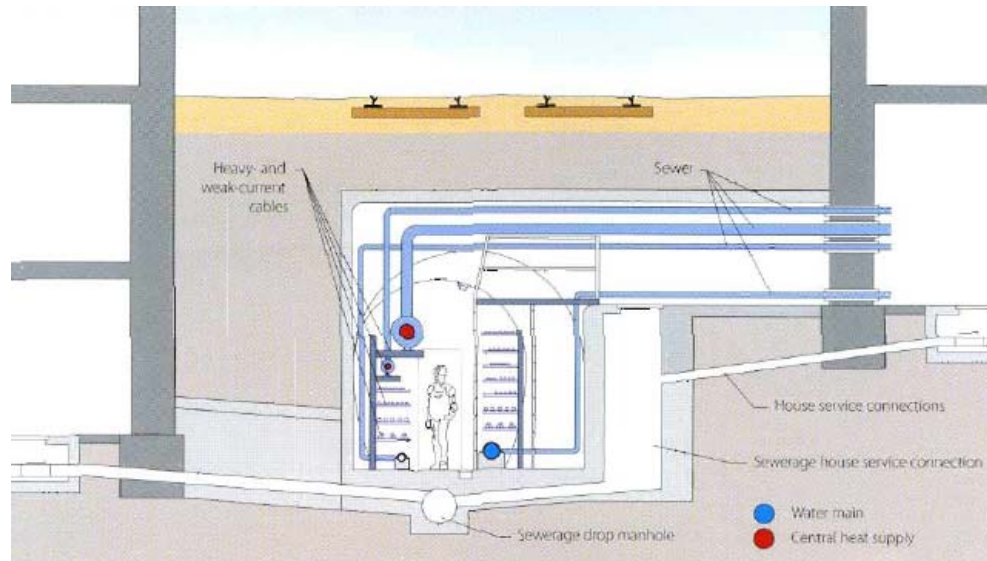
Cross Section of the Utility Tunnel and Connection to the Buildings
